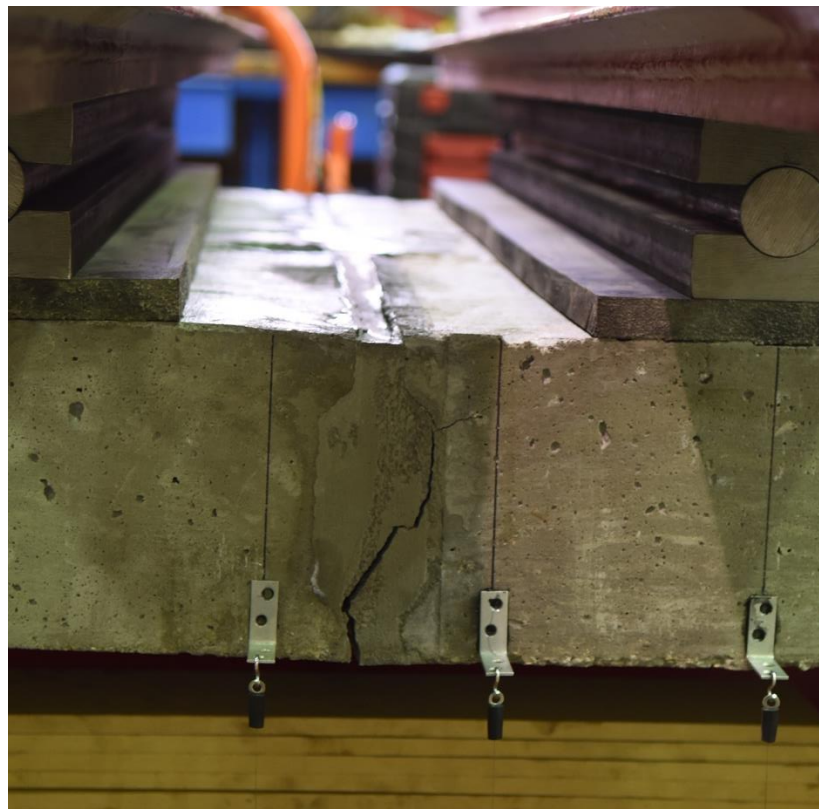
Initial Cracking through the Grout (Specimen C-C-1)
